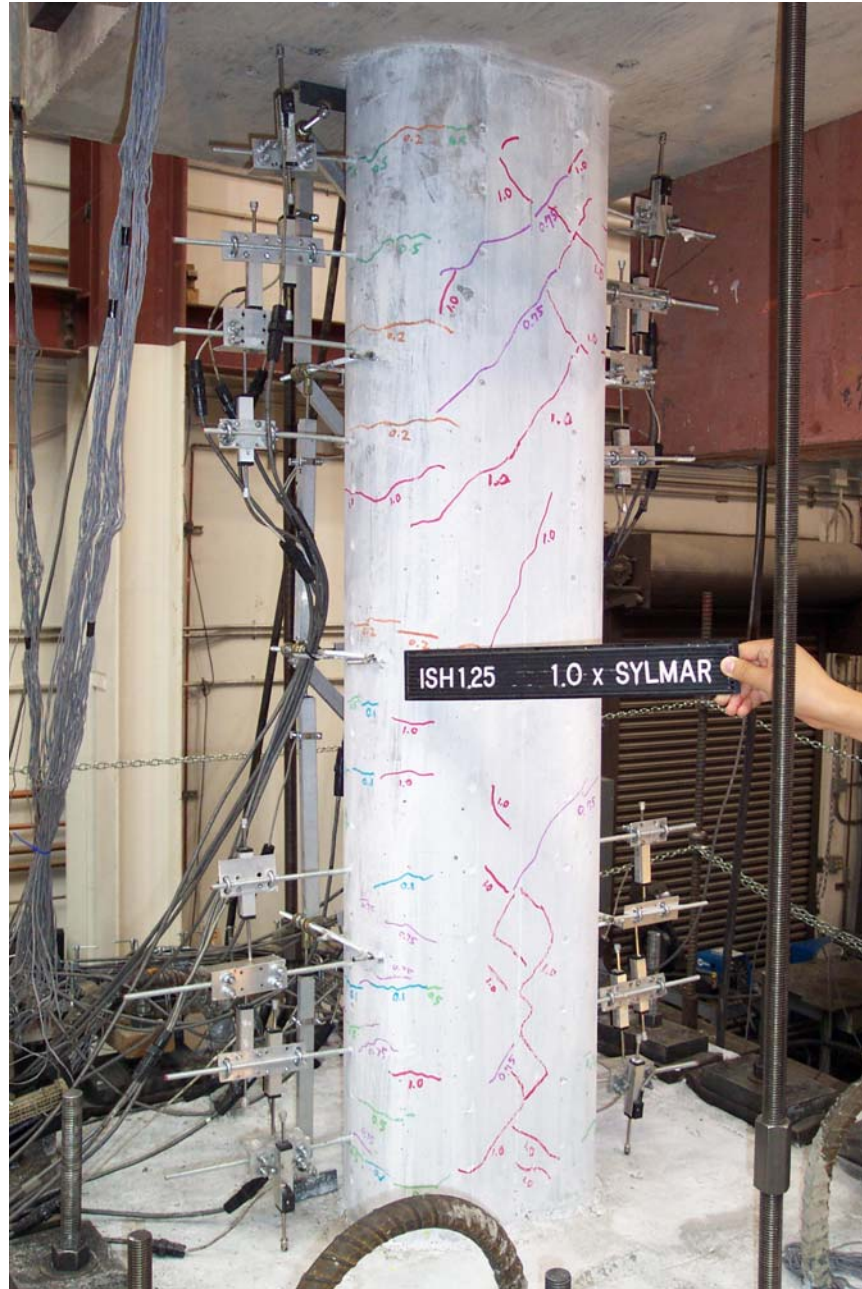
Shear Cracks Top and Bottom ($\mu_d = 1.4$) Specimen ISH1.25
